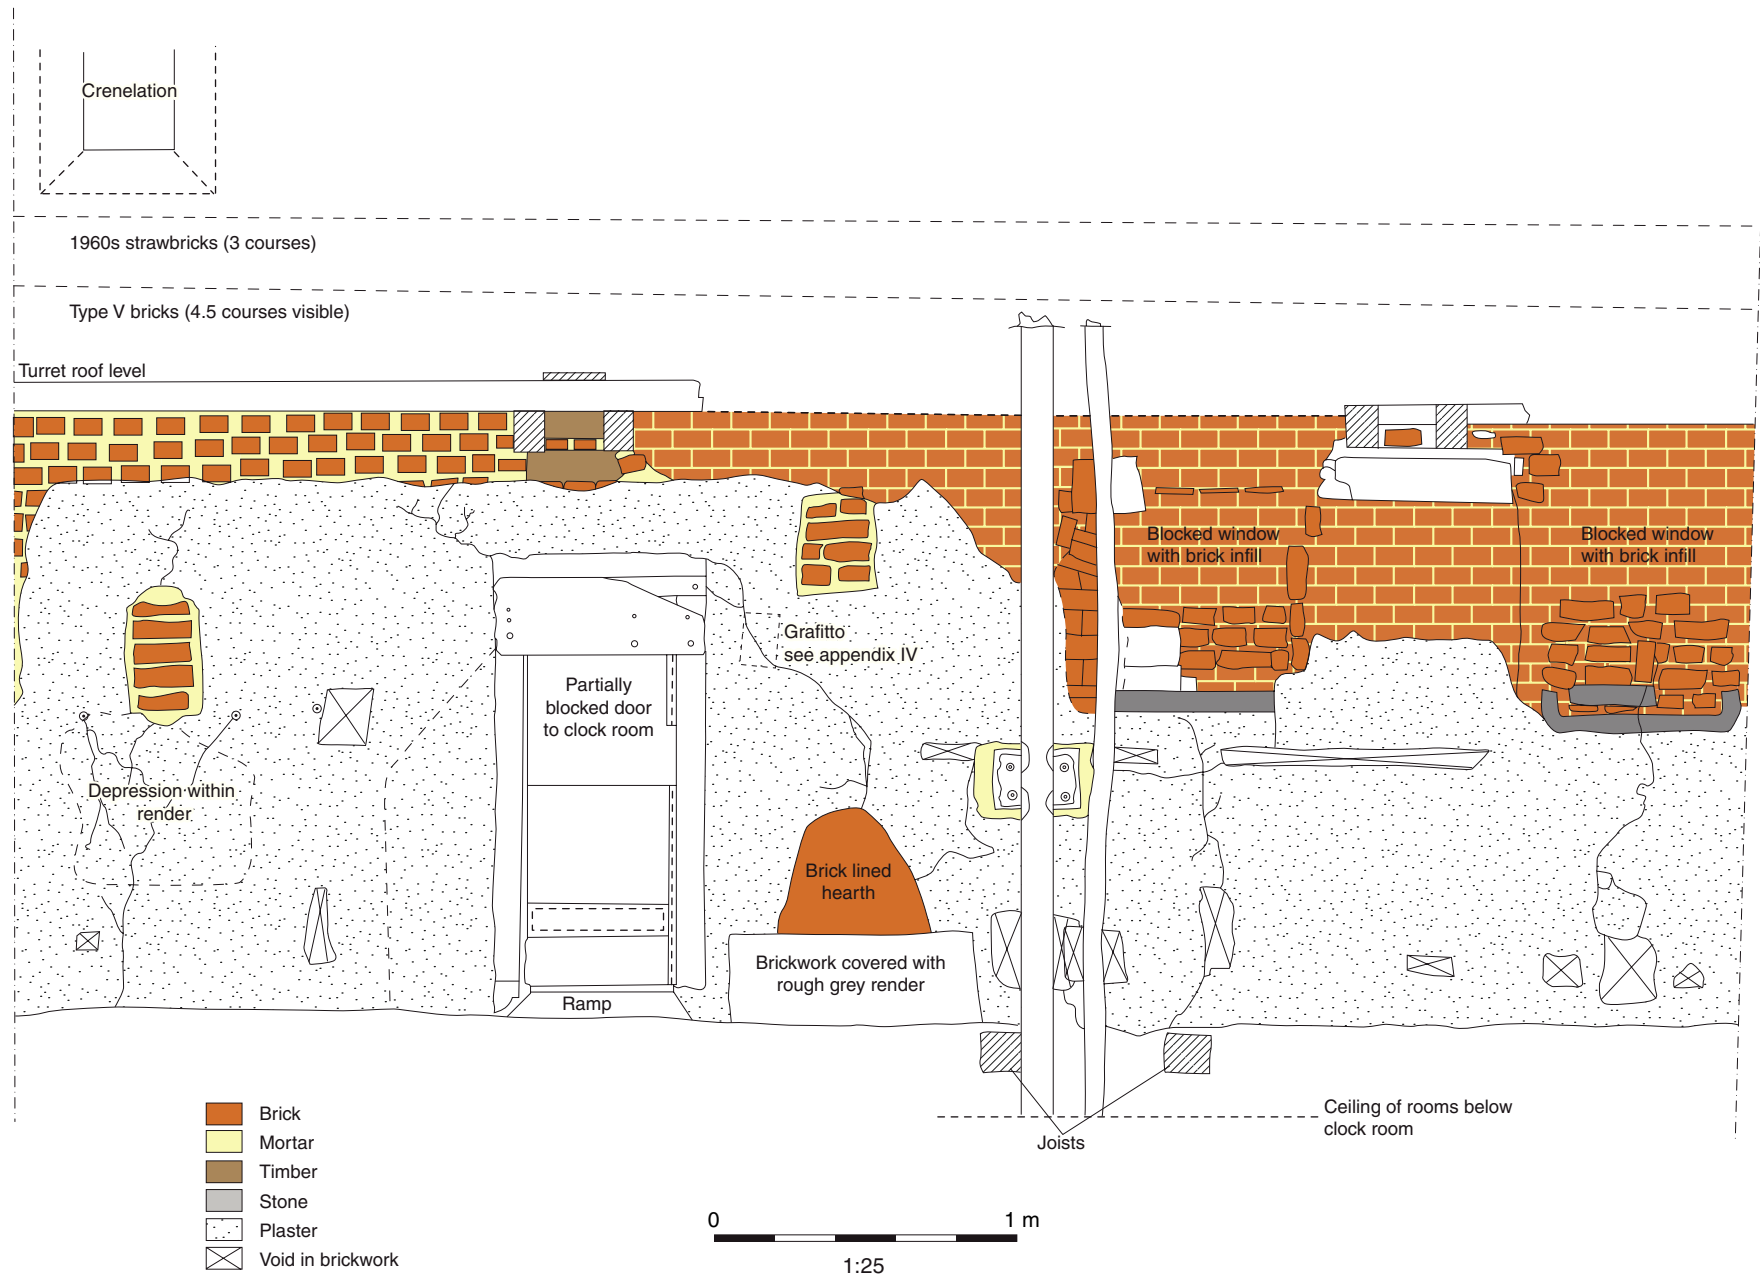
South-west Turret - interior elevation of room adjacent to clock room
